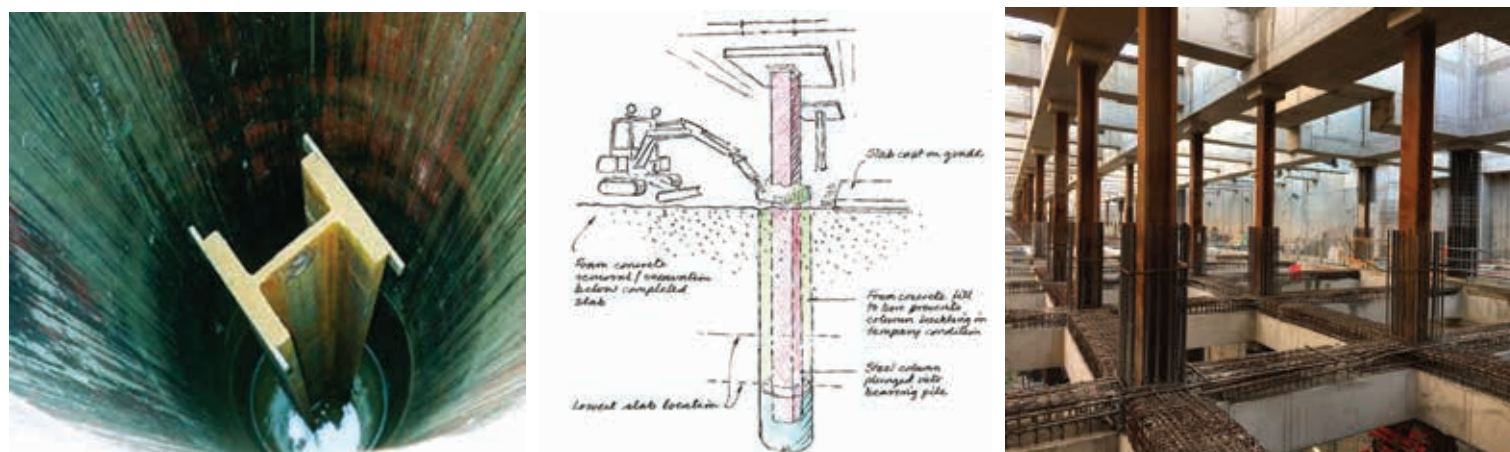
| View of internal profile (Left) [5]; principle of the plunge column construction method (middle) [3]; View of the columns in the final building (right) [6]
